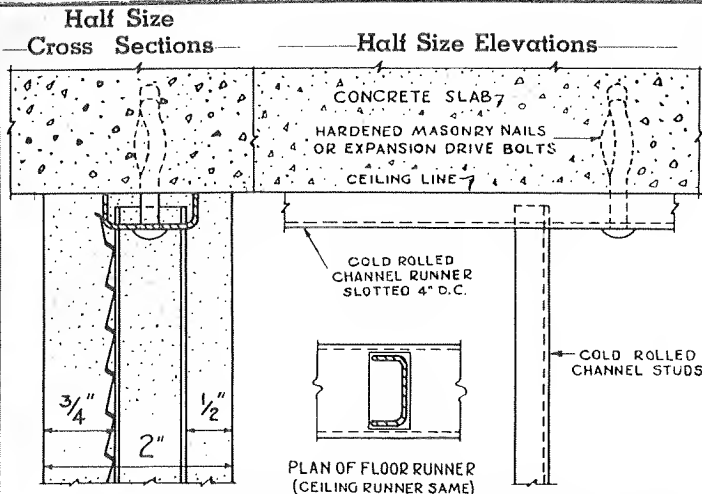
PUNCHED RUNNER SYSTEM—1-inch channel runners are attached to floor and ceiling with masonry nails or other anchors. Runners have slots punched every 4 inches to receive channel studs, spacing of studs depending on type and weight of Metal Lath used. Studs are dropped into slot in floor runner and slipped into slot in ceiling runner.
